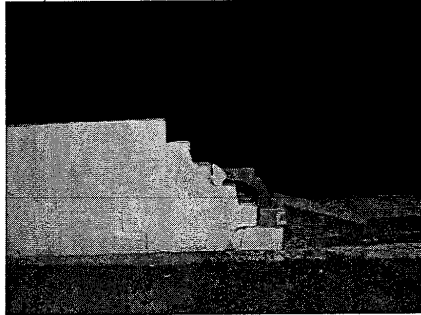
Collapsed unreinforced masonry boundary wall (Photo: Chadwell).
